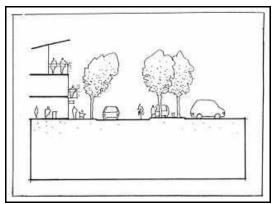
New development on the site to the north of the Landmark Hotel should front onto this street and be of not less than three storeys. Car parking should be to the rear of the building or underground.
